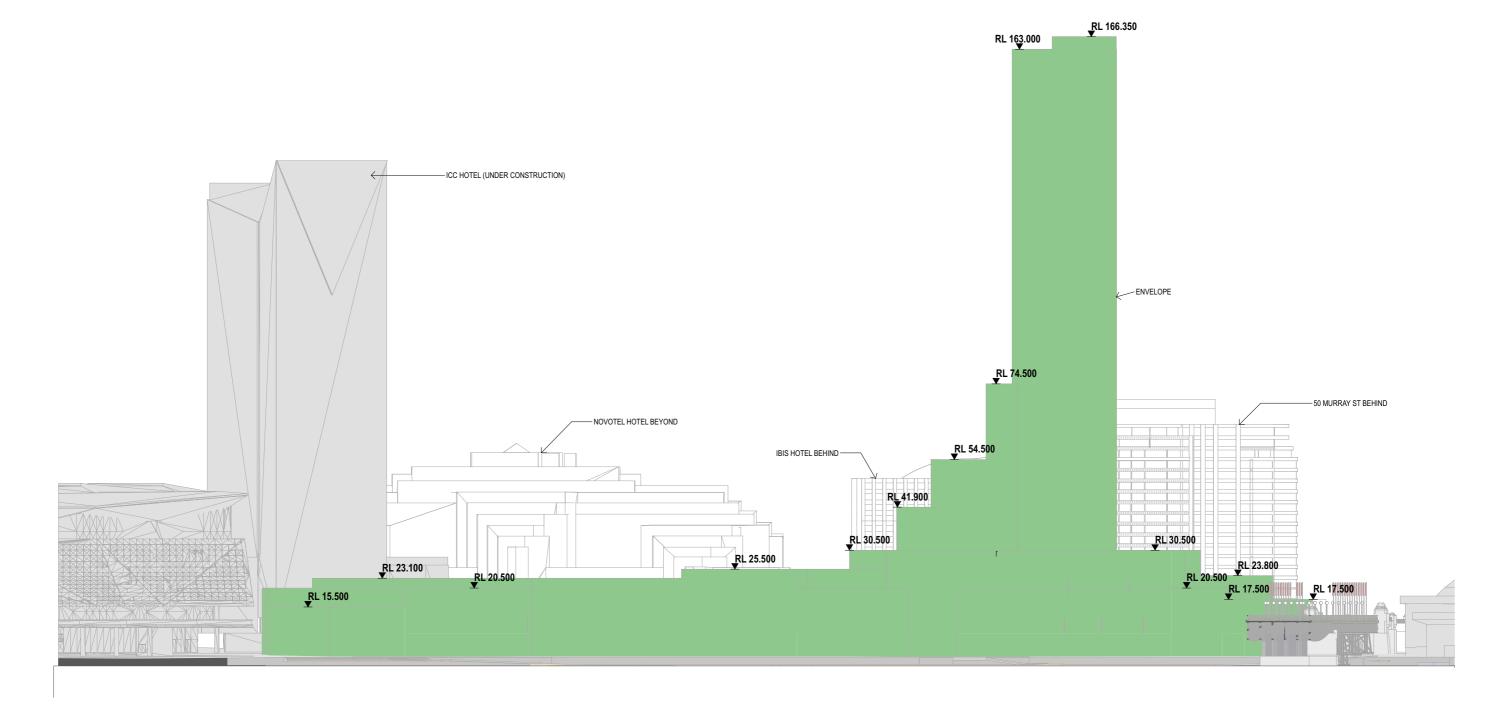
Proposed envelope - elevation (FJMT).
